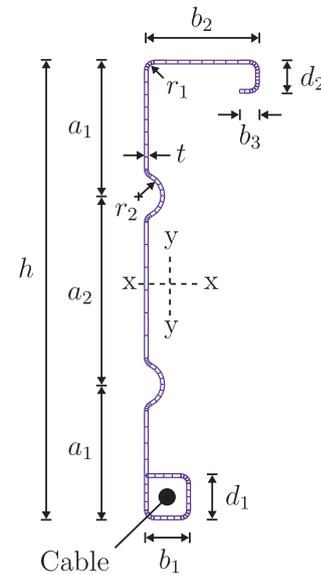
Reference cross-section profile of the studied prestressed cold-formed steel beam. External dimensions are shown; r_1 and r_2 are the internal radii of the corners and web stiffeners respectively. Note that the x–x and y–y axes shown are the strong and weak geometric axes of the cross-section respectively, and that in-plane bending about the x–x axis is studied herein.
